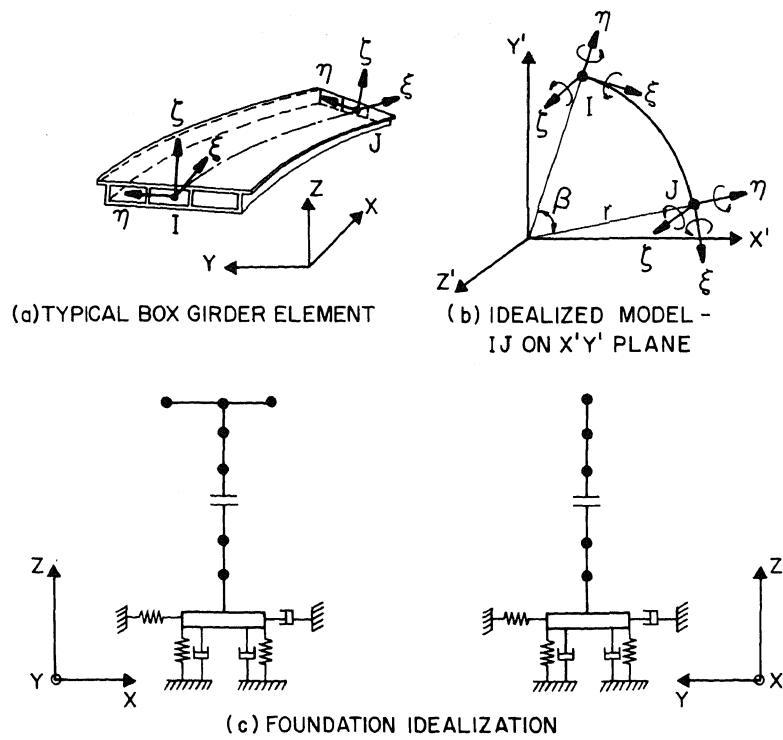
MATHEMATICAL MODELING OF BRIDGE STRUCTURAL SYSTEM
